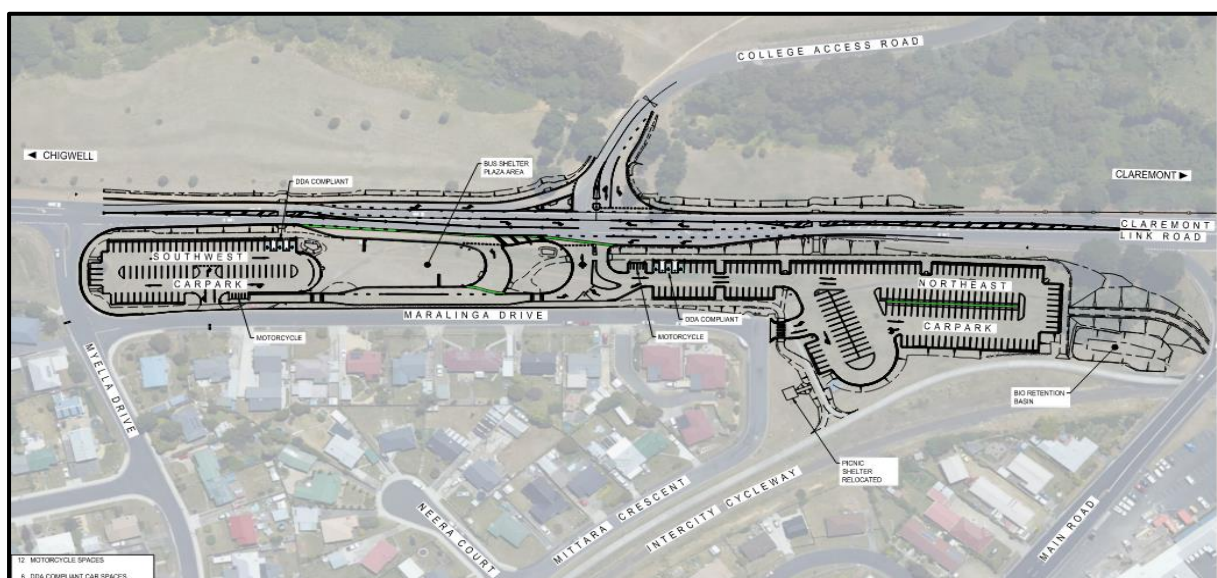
Site plan of 61 Claremont Link Road and Claremont Link Road, Claremont, Maralinga Drive and Main Road, Berriedale, and Main Road, Granton.
